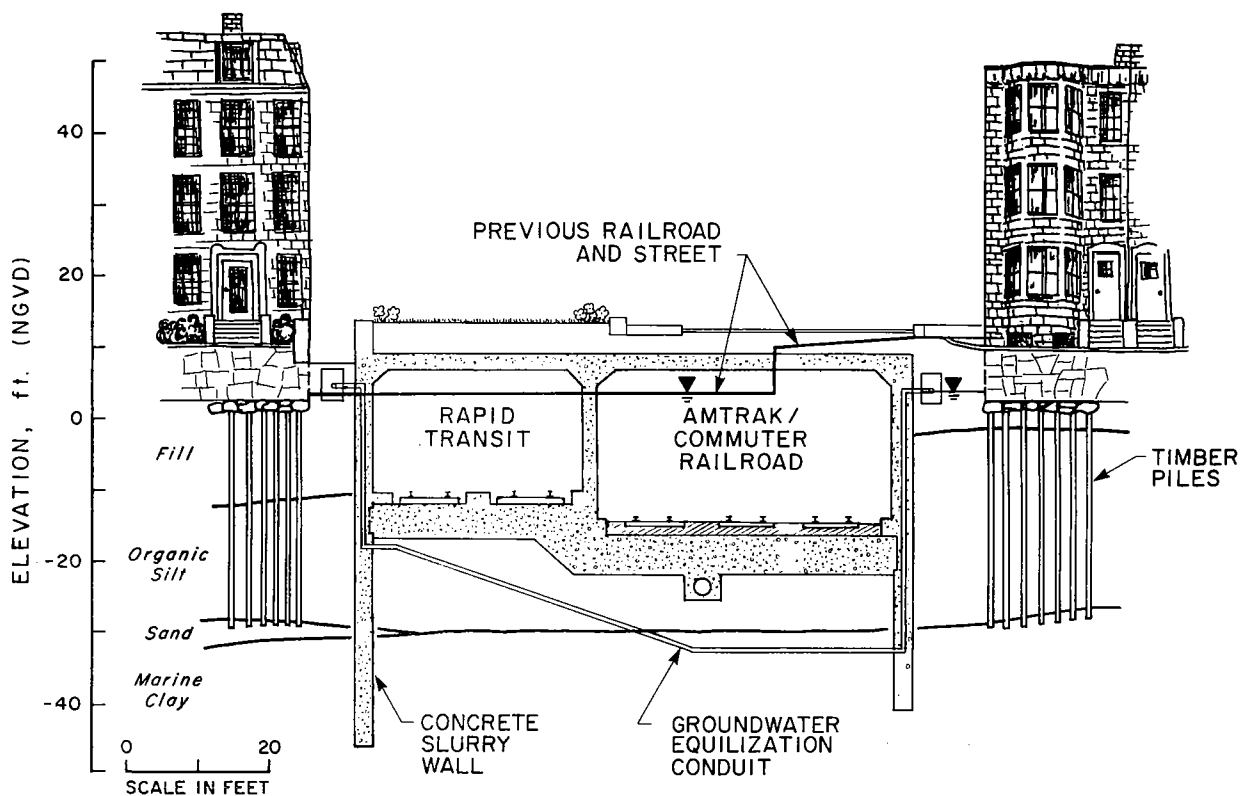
Typical Section of the Tunnel Structure through Back Bay
